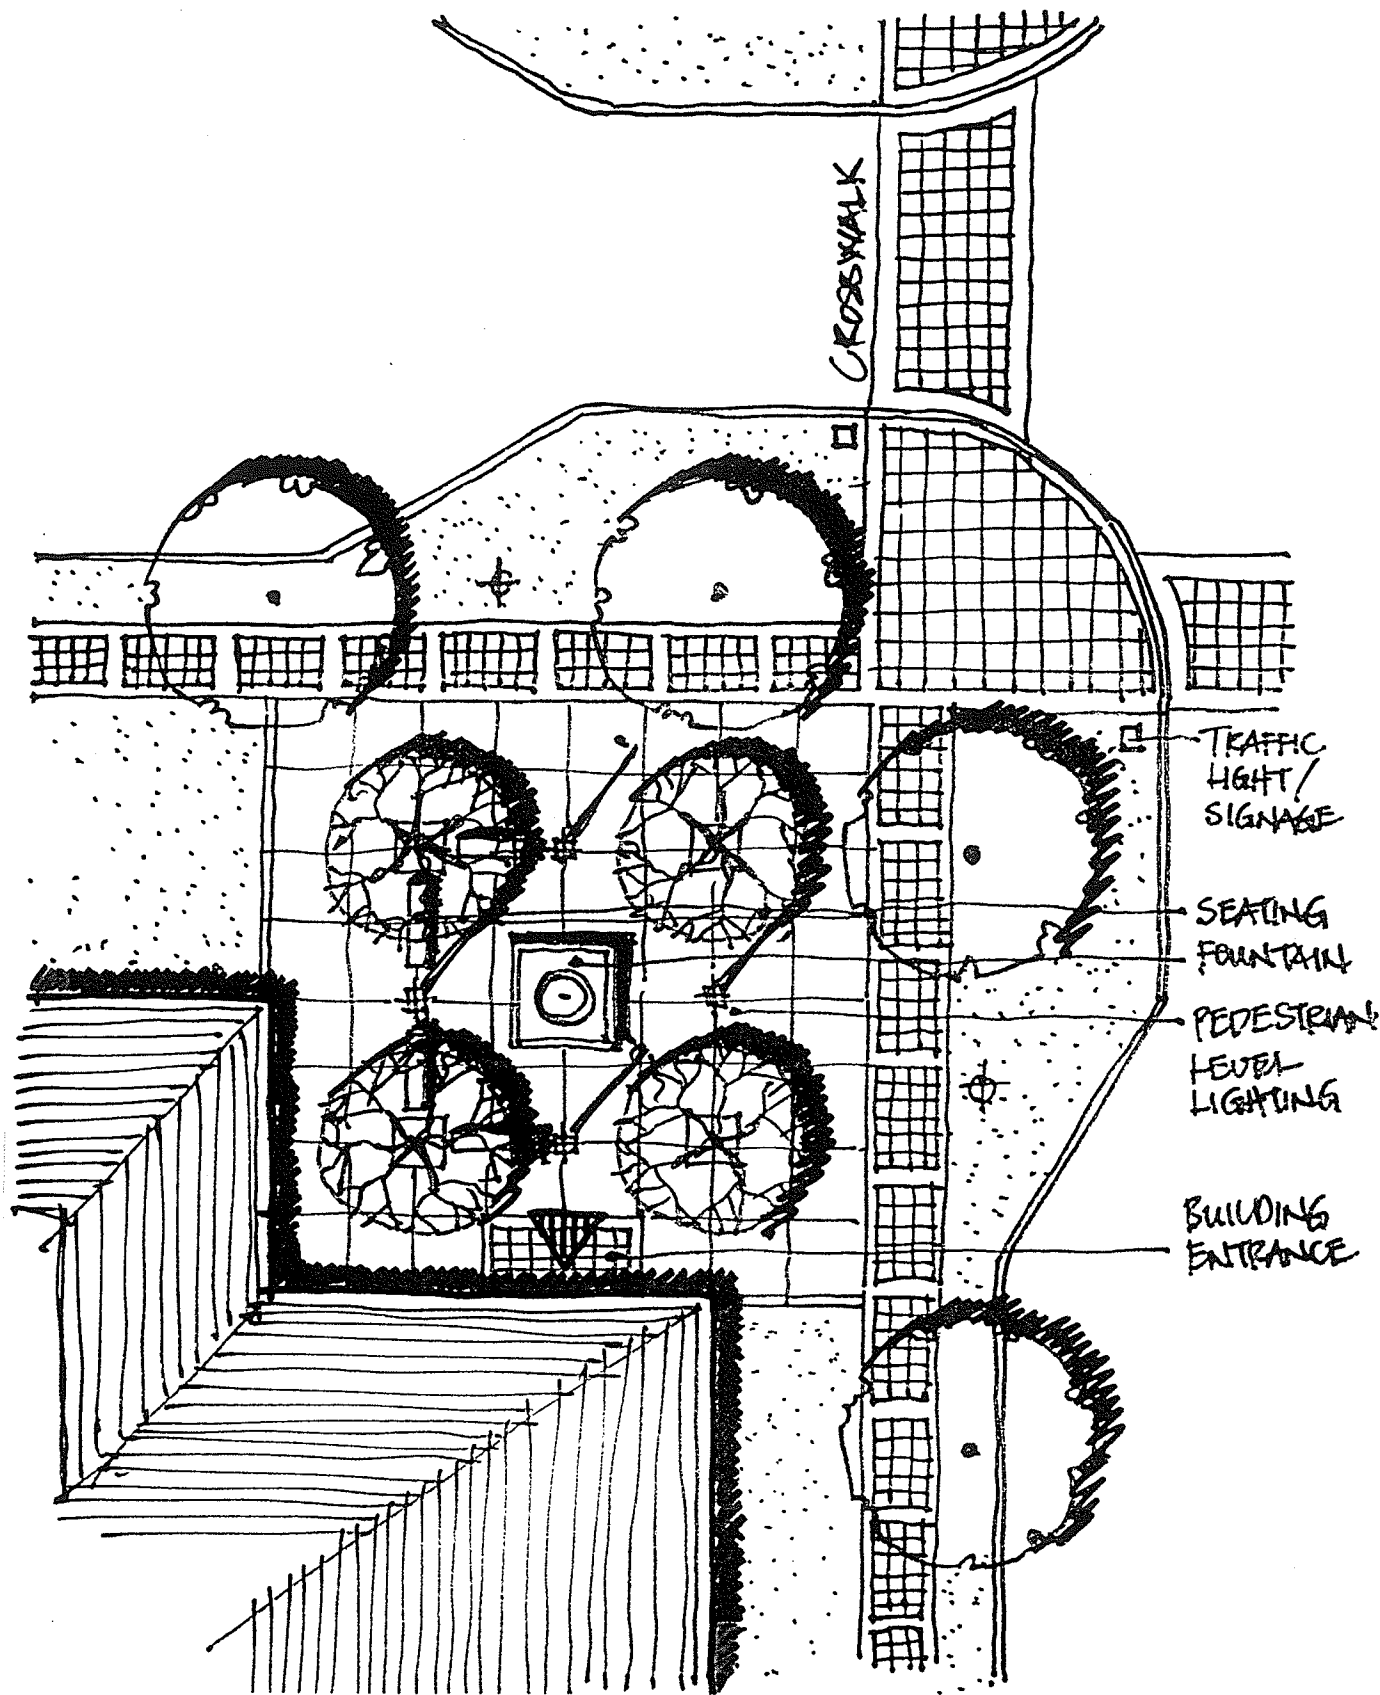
Sidewalk treatment and Nodes (detail of a Cornwall Street node)
